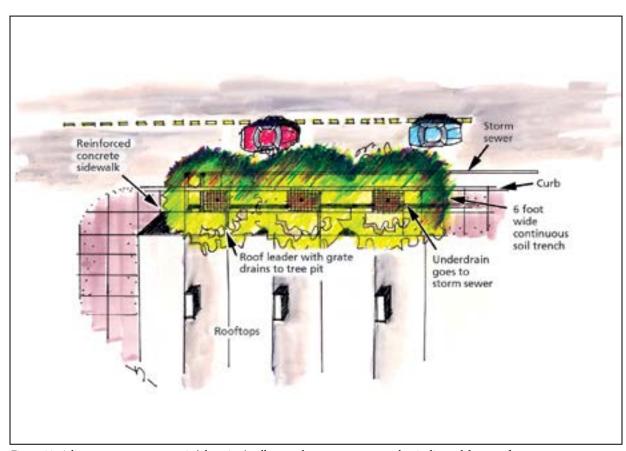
A linear storm water tree pit (plan view) collects and treats storm water that is directed from rooftops.
